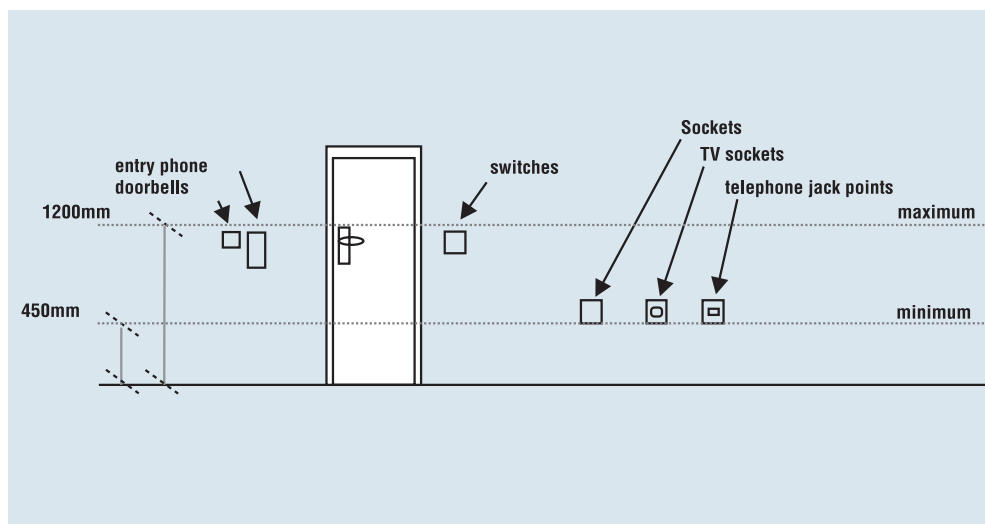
Heights of wiring accessories (from the *IEE On-site Guide*)
